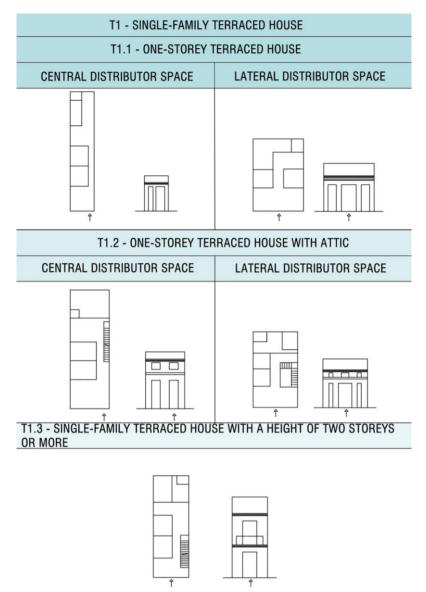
Details of plan distribution of terraced house, for single cell (image created starting from details available on the Valencia City Council website and in (Pastor Villa R., 2011))
